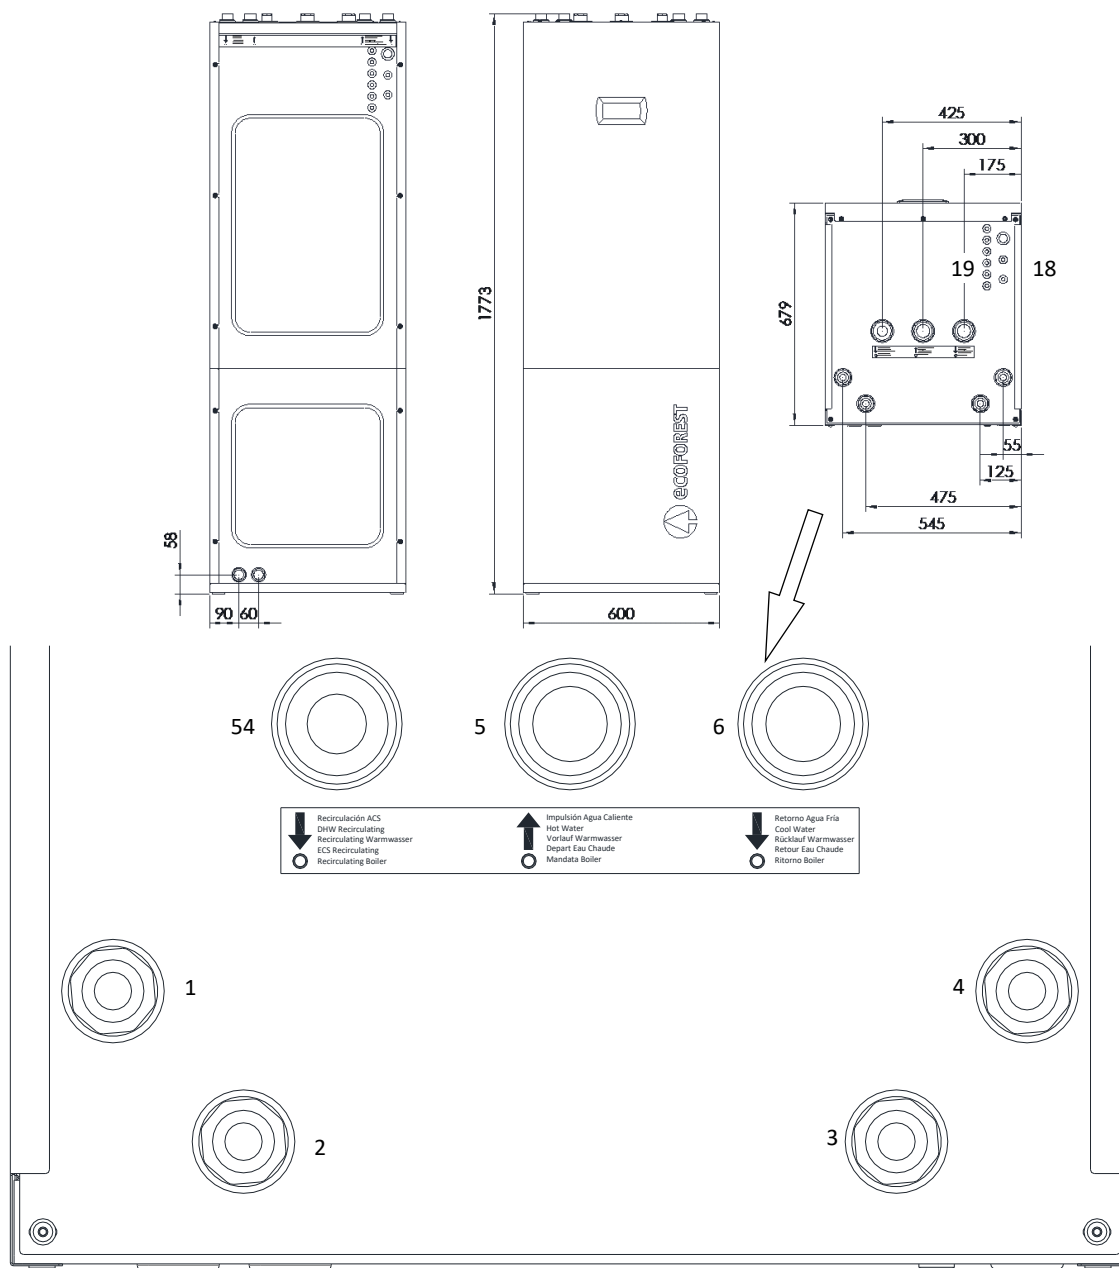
Overall dimensions and hydraulic connections of Hidrokit Compact indoor units (Dimensions in mm).
